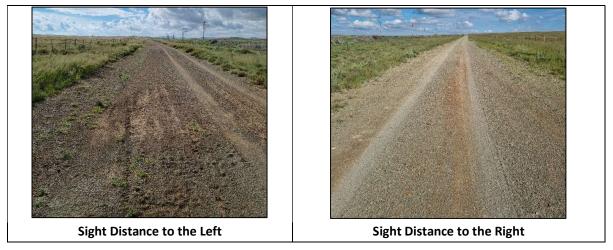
Shoulder Sight Distance (SSD) at the First Existing Access along Burgerville Road
